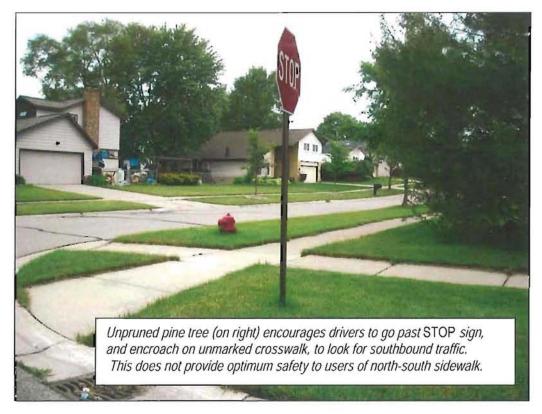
Northeast Corner of Knollwood and Loganberry Ridge North
